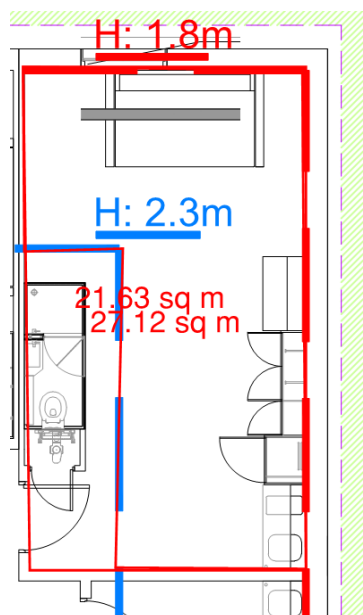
(above): Image of one of the single units, showing the overall floor area and the space within the lower ceiling height
